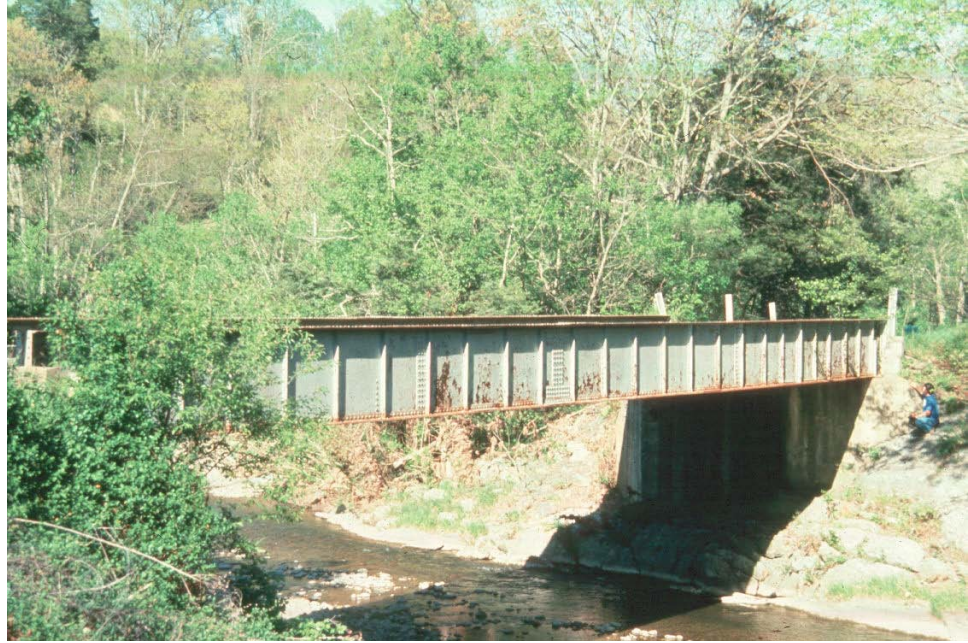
Flexural Zone on a Through Girder Bridge
